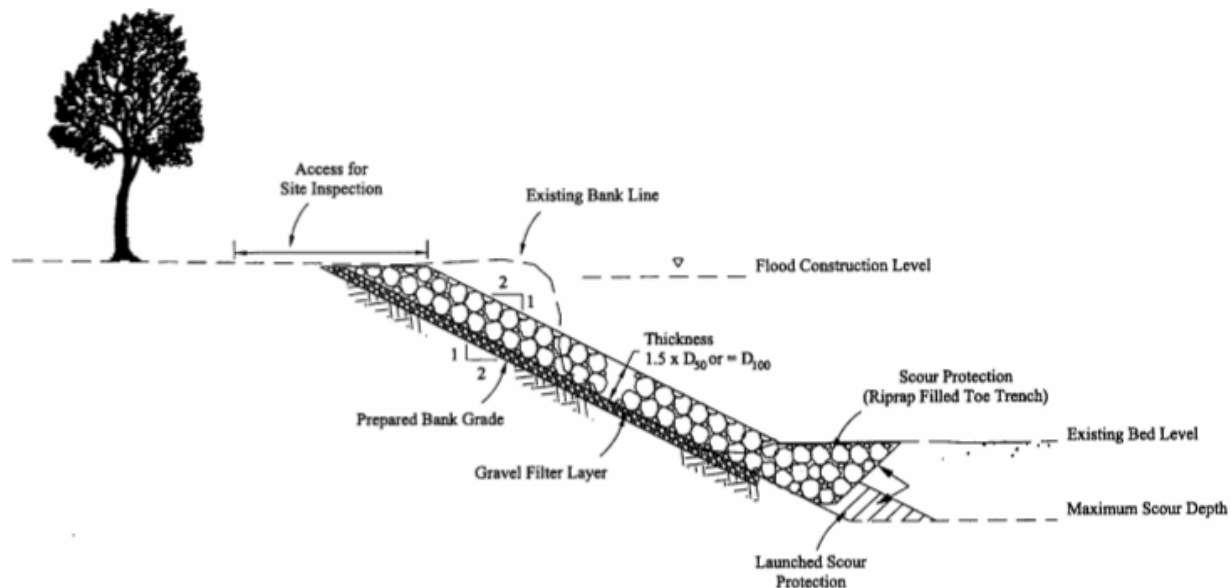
Typical riprap cross-section (Source: MELP (2000)).
